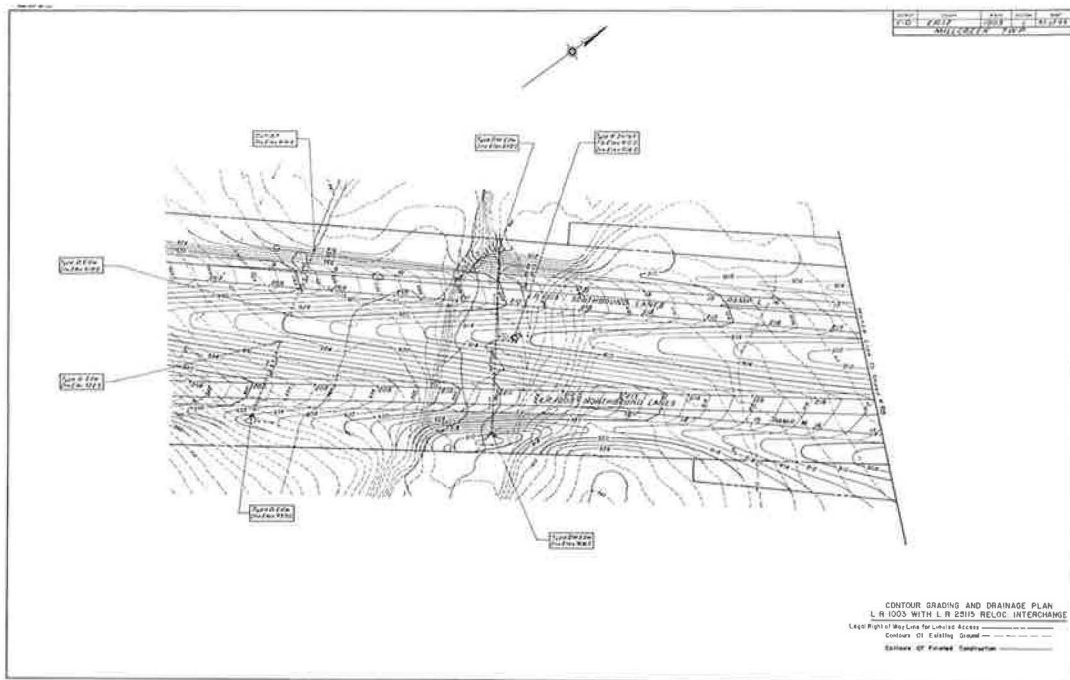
Representation of contour grading and drainage plan (not to original scale).
